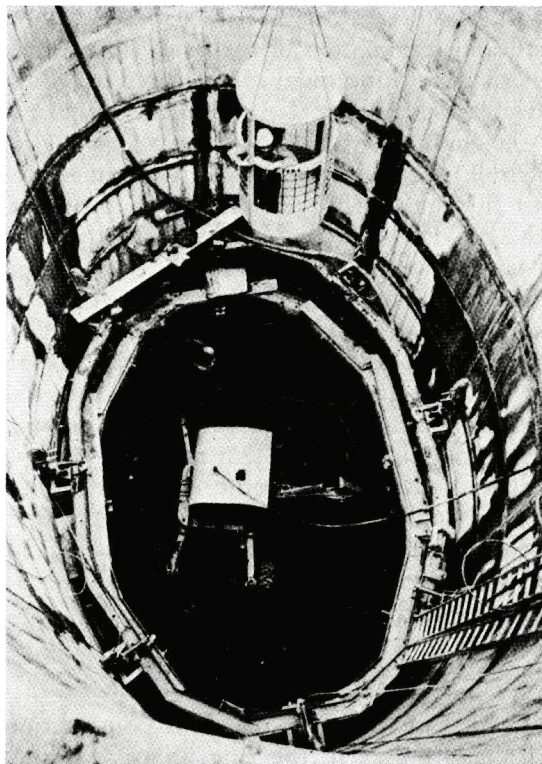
View into the shaft with formwork, excavator and lifting equipment
